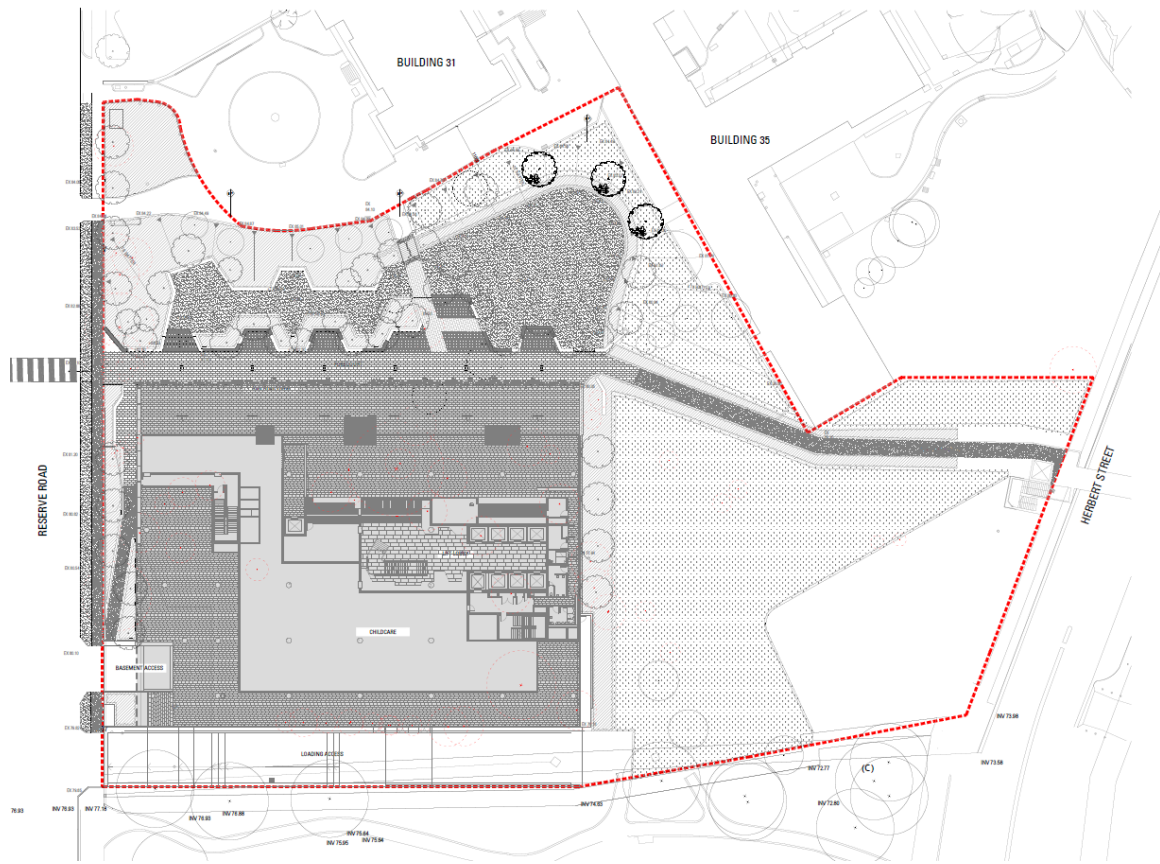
Proposed Masterplan (source: Arcadia Landscape Architecture)
